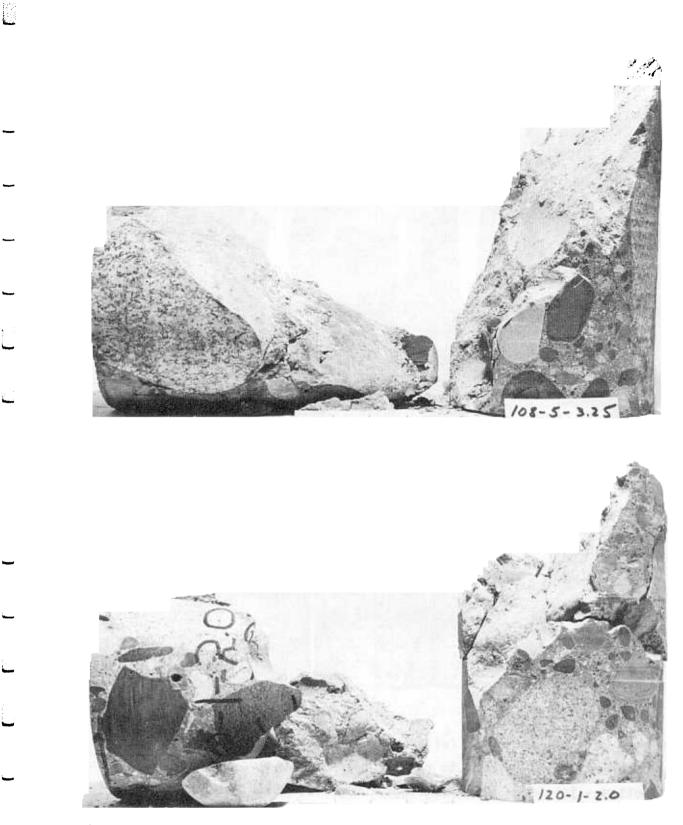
Photograph of unjointed concrete showing failure surface Top - at 450 lb/in² lateral load (note splitting tangent to large aggregate) Bottom at 1,000 lb/in² lateral load (irregular break) C-8322-58 C-8322-59
